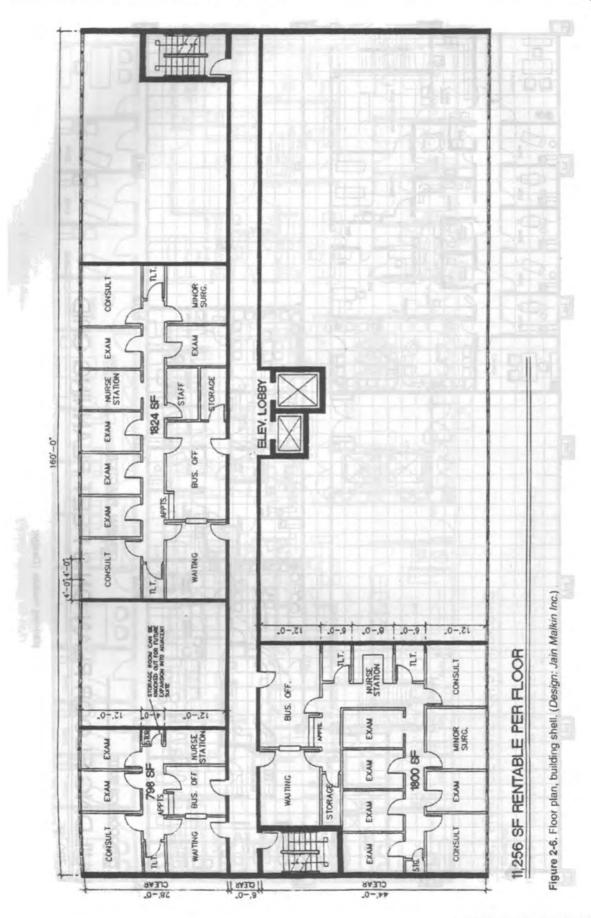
Floor plan, building shell (Design: Jain Malkin Inc.)
